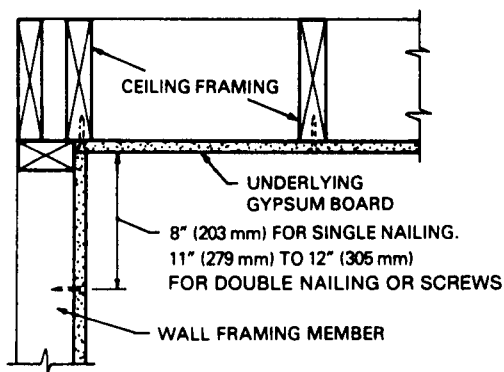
Vertical Section, Ceiling Framing Parallel to Wall
